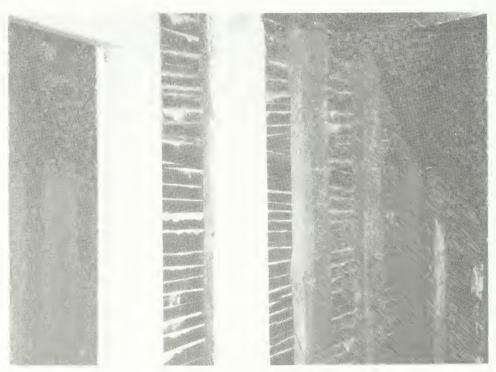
Second-story kitchen hall (Room 206), south end of east wall.
